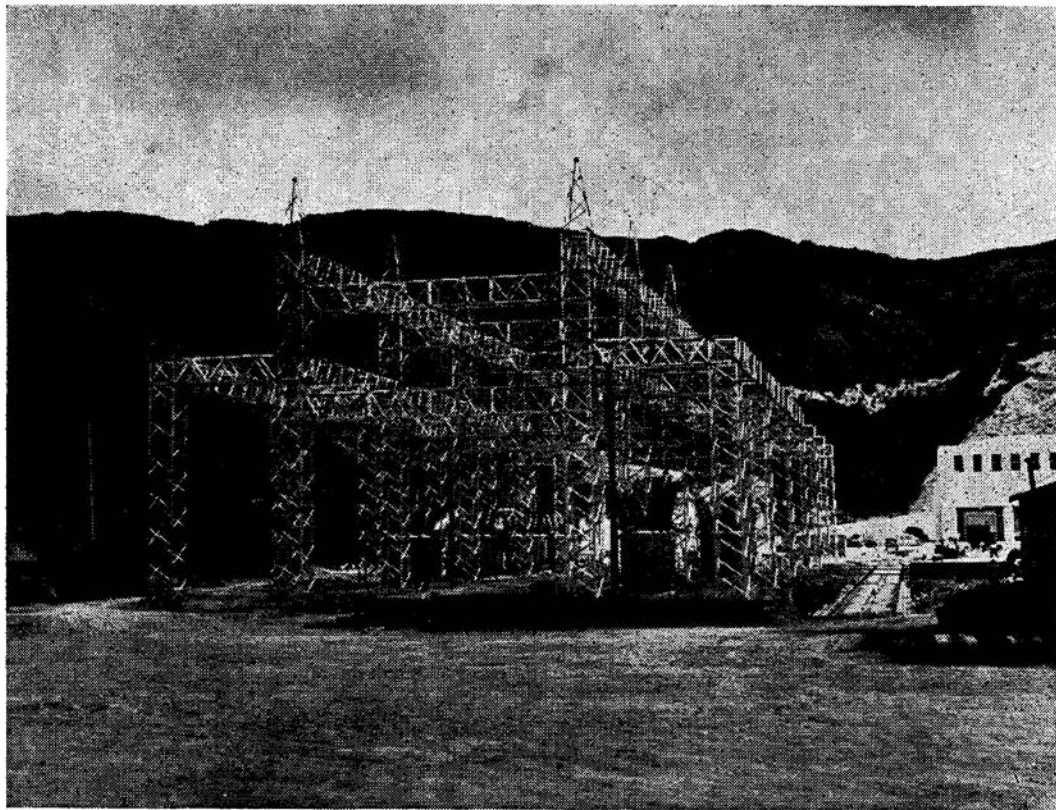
Aluminium-alloy substation structure. Photograph by courtesy of New Zealand State Hydro - Electric Department and Canterbury Engineering Company, Christchurch
